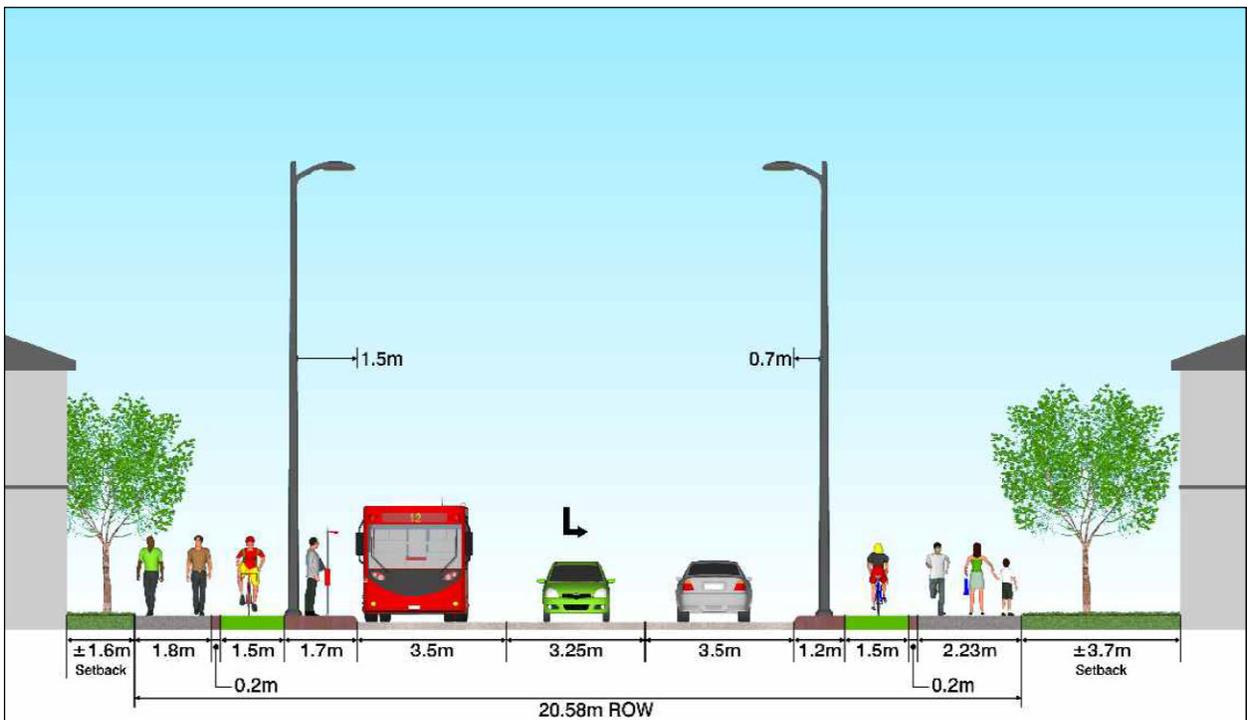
Alternative Design 5 Cross Section: Main Street at Beckwith Road/Bower Street (North Side)
